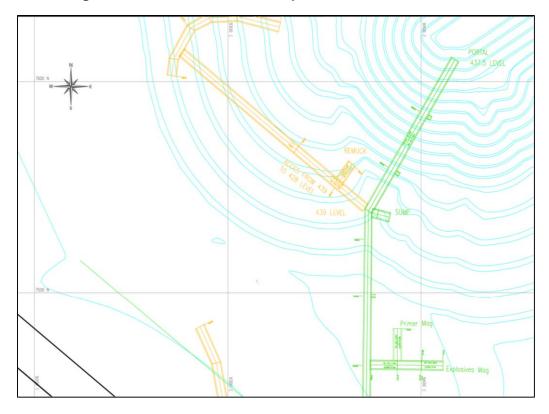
Plan View of Ramp from Surface to 439 Level
